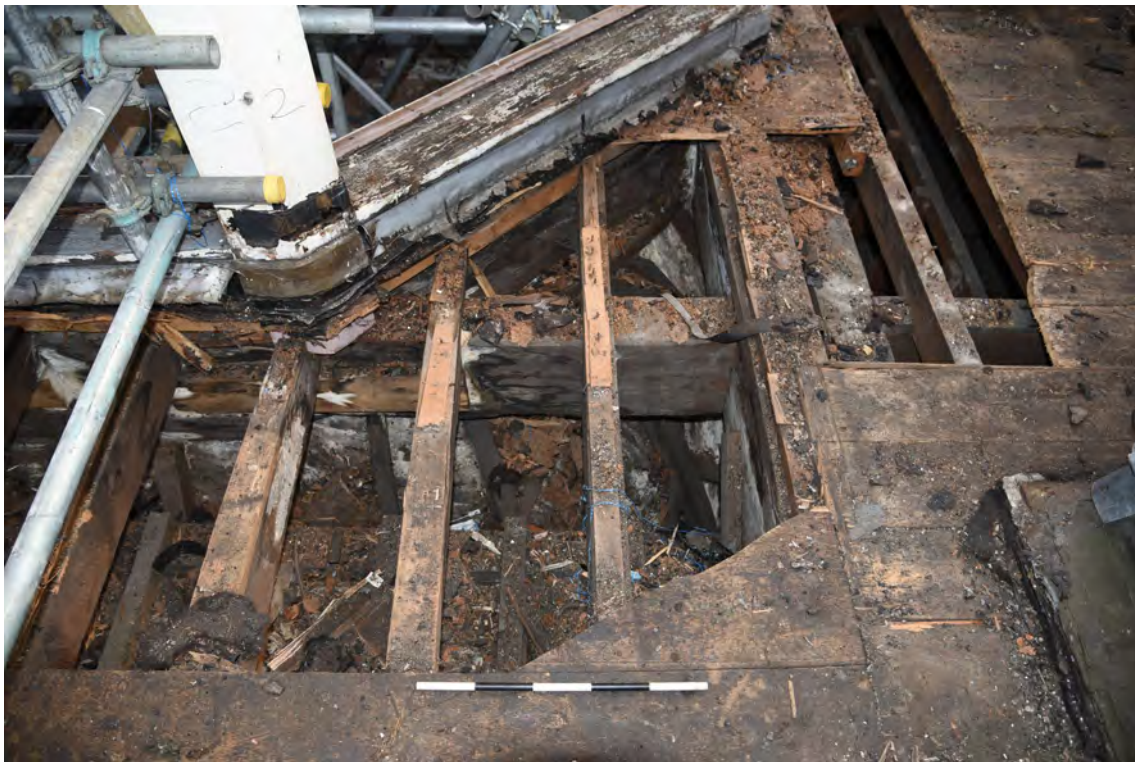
Lantern base, tie beam and roof joists, SW side, looking E, scale 50cm (BRH098)
